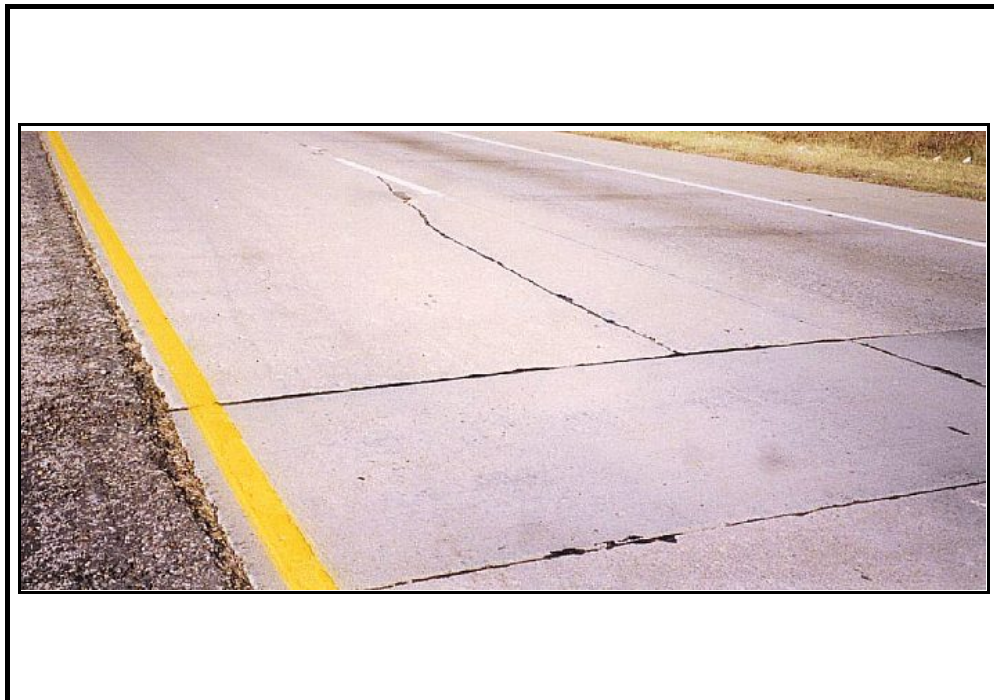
Longitudinal Cracking in Jointed Concrete Pavement, Medium Severity
